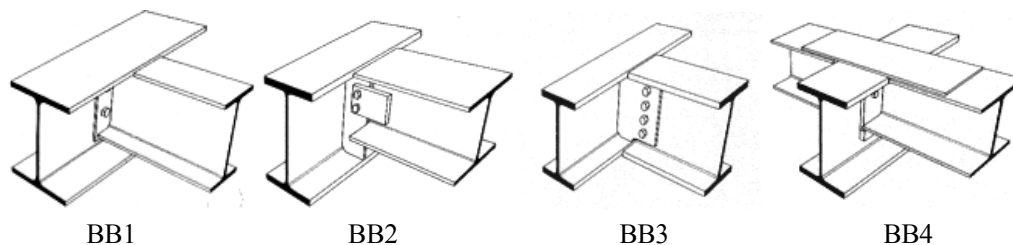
Four common beam-beam connections. BB1-BB3 are considered simply supported. BB4 is an example of how a connection can be made continuous (Adapted from Treiberg 1987).
